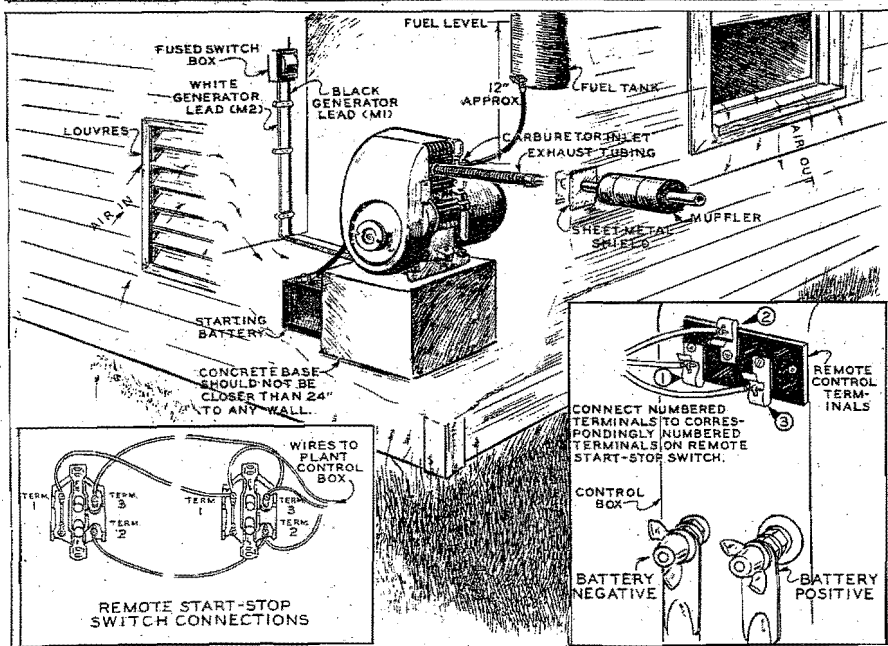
FIG. A - TYPICAL INSTALLATION - REMOTE START PLANT
